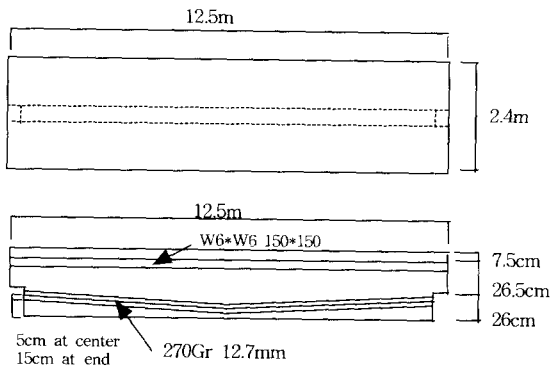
Example of Plan and Section of Single Tee W/D the Least Depth(DT-1D)
